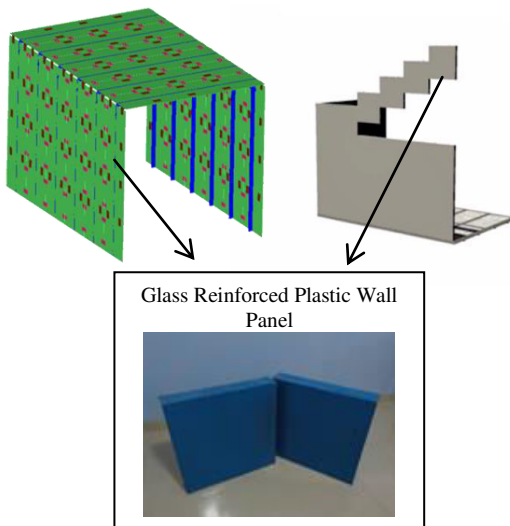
The portable blast room using fiberglass modular wall panel, [5].
